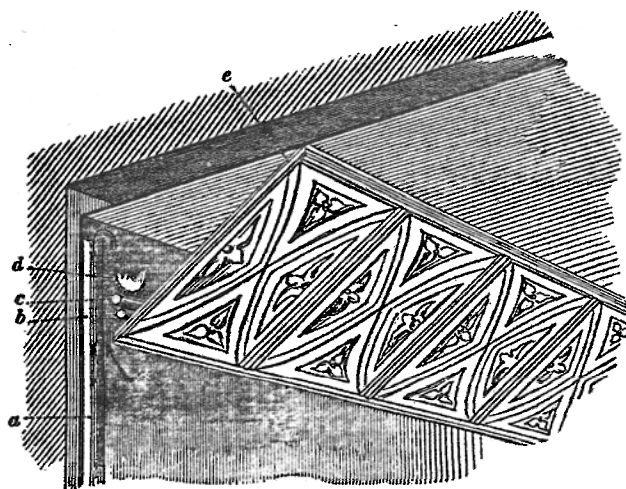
David Boswell Reid, system of gas lighting behind the glass ceiling panels (Reid, *Illustrations*).
